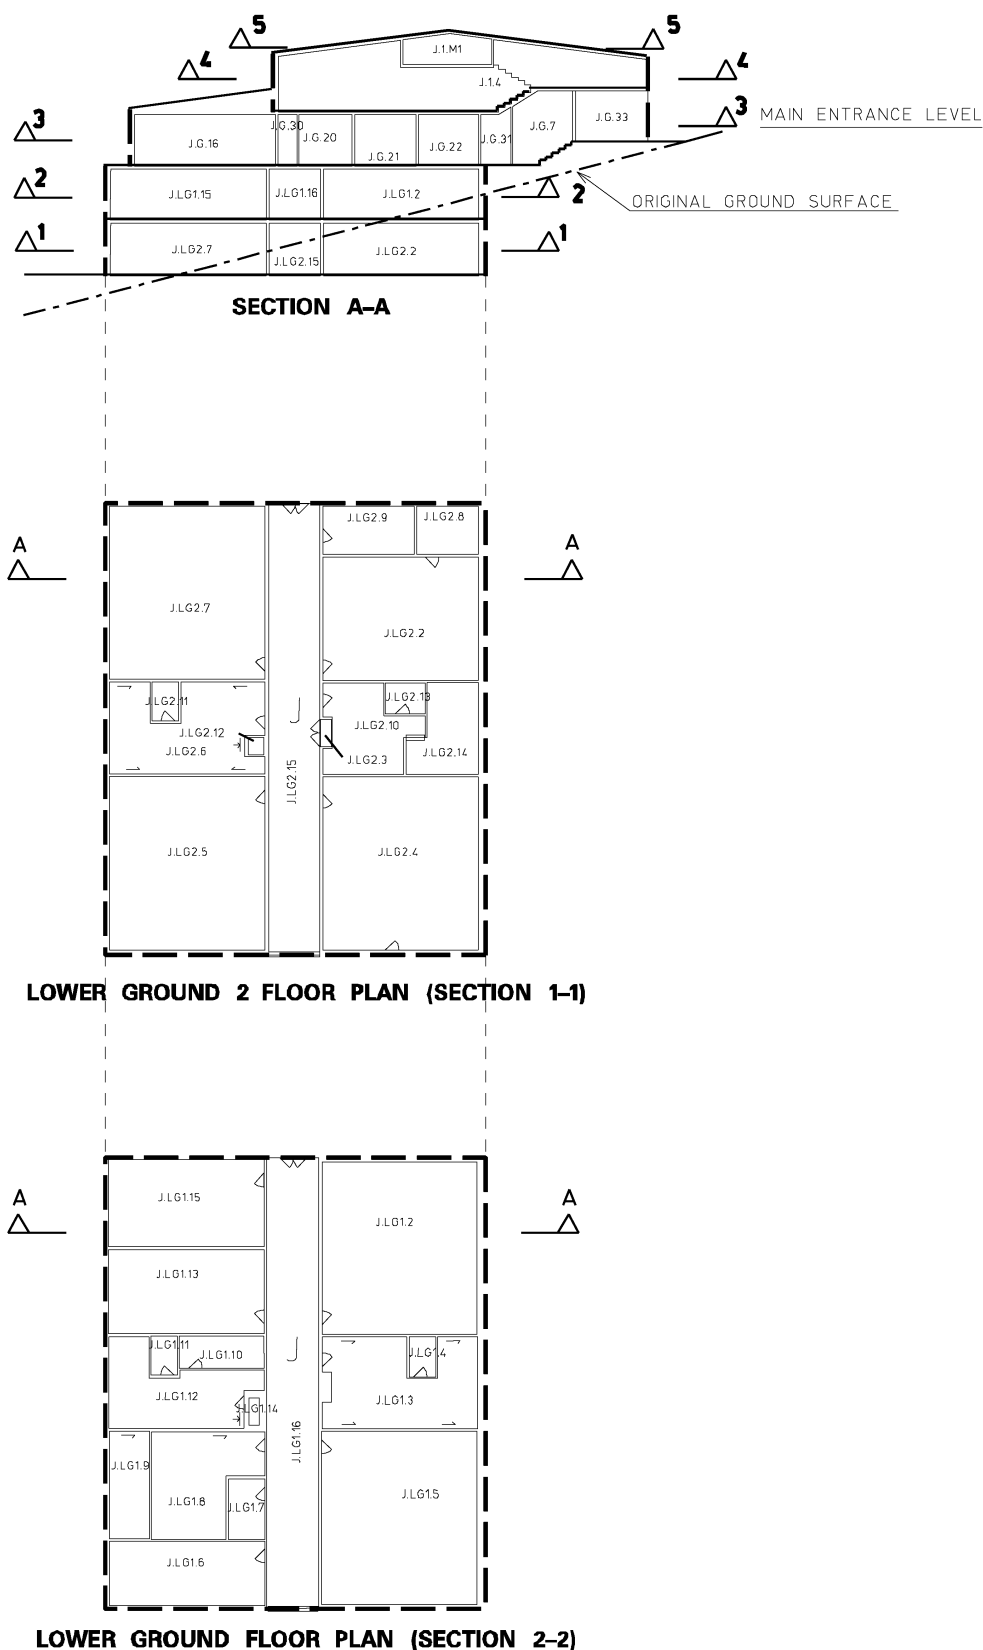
Example drawing of spaces within building outline on sloped site with split levels
